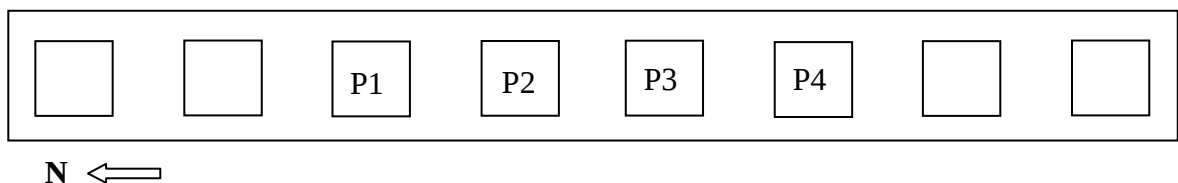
Plan View of Pier 208 at Gandy Bridge
